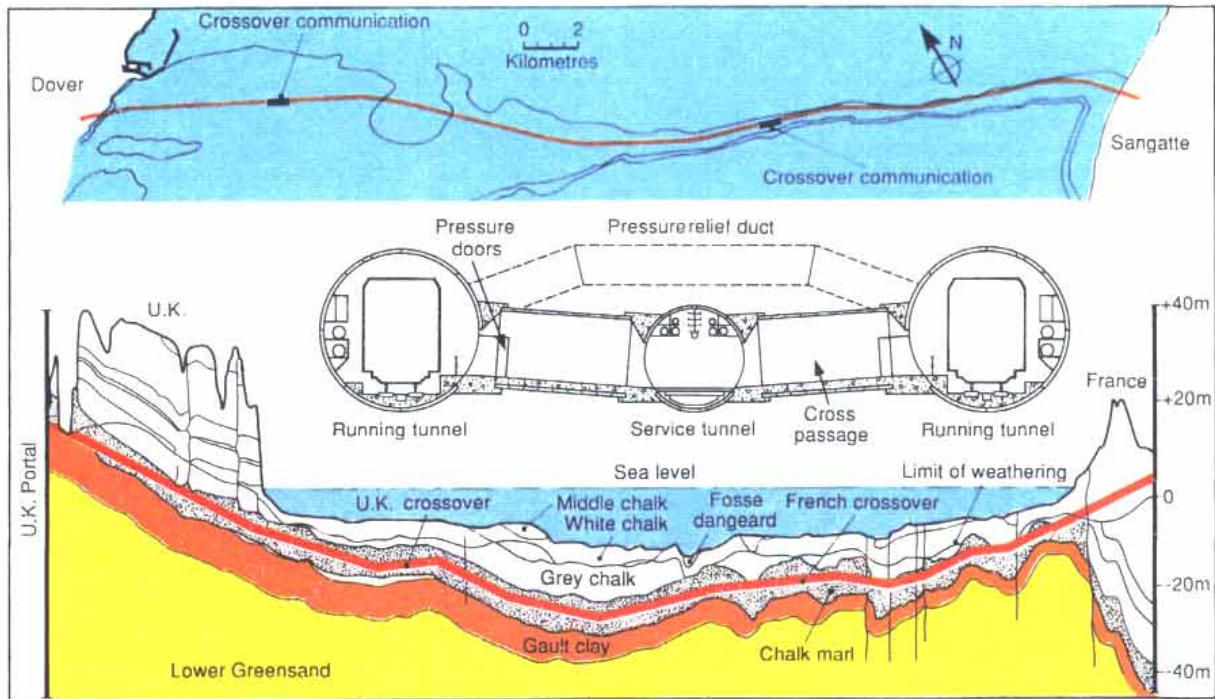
Composite diagram showing plan and geological Section of the Channel Tunnel and layout of the three sub-sea tunnels
